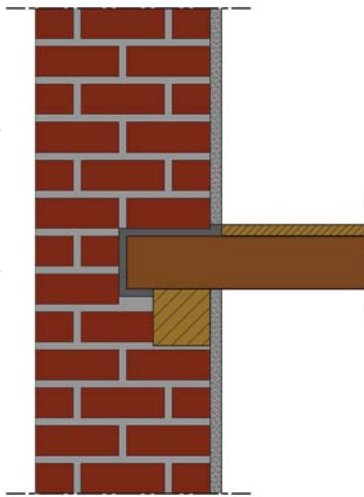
Danish construction used by [Harrestrup, M. 2016].
